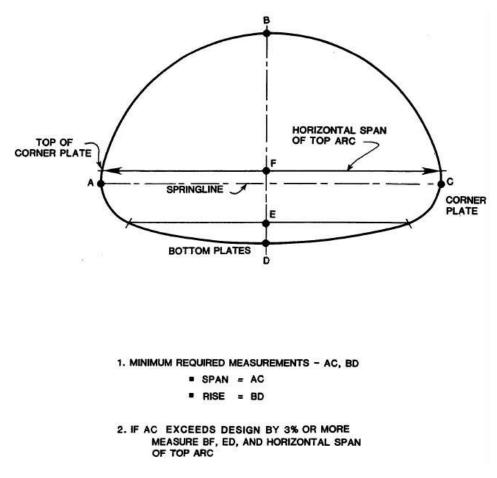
(Exhibit 85) Shape Inspection Structural Plate Pipe Arch
